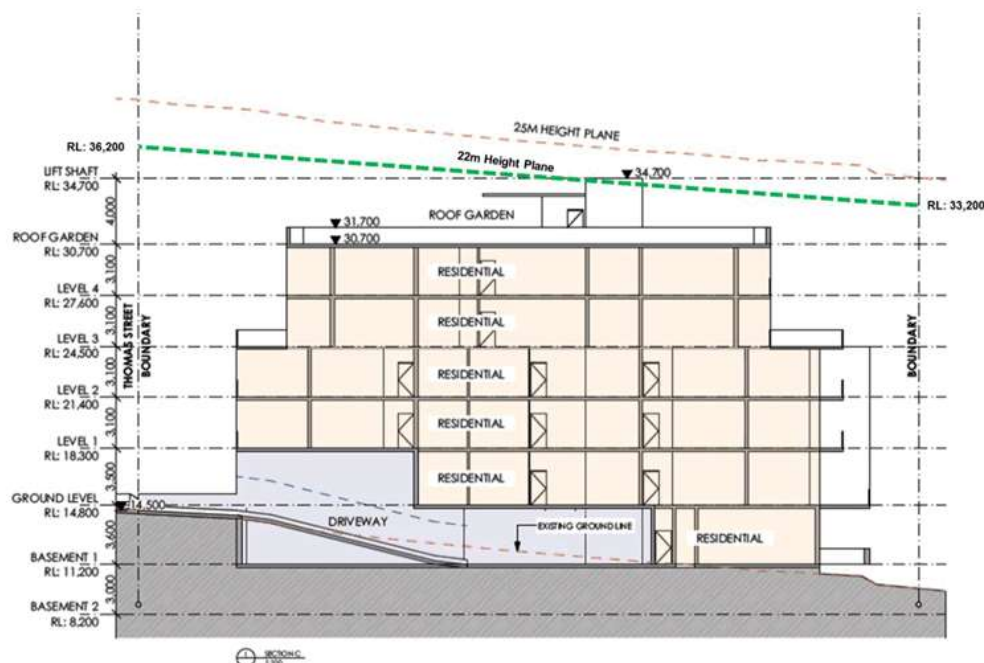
Section facing east from adjacent townhouse development (Source: PTI Architecture)
